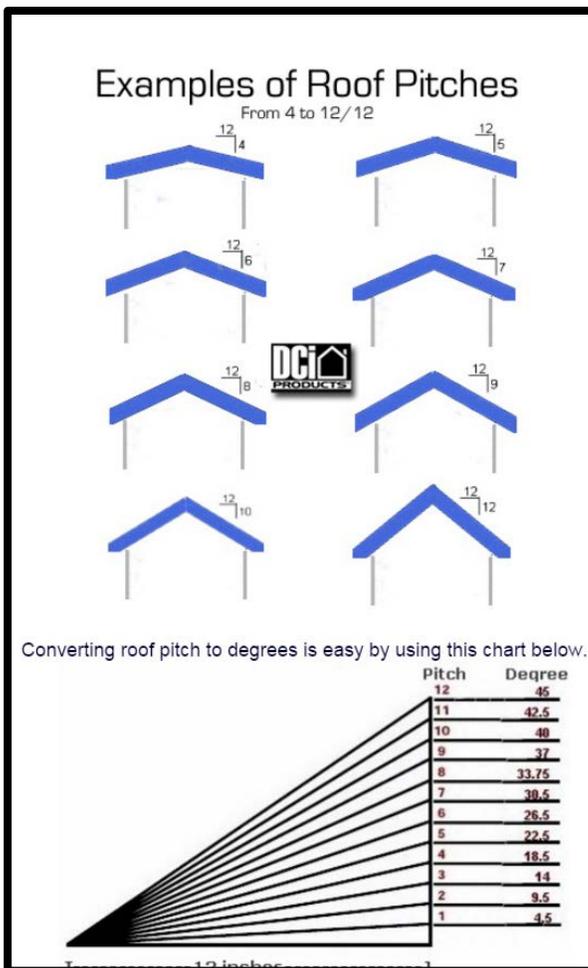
Examples of roof pitch – Staff recommends minimum pitch of 7/12 for historic outbuildings
